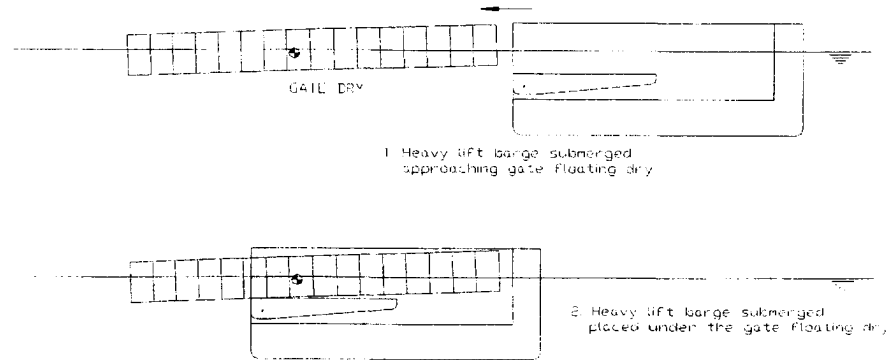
Heavy Lift Barge Retrieving Gate
